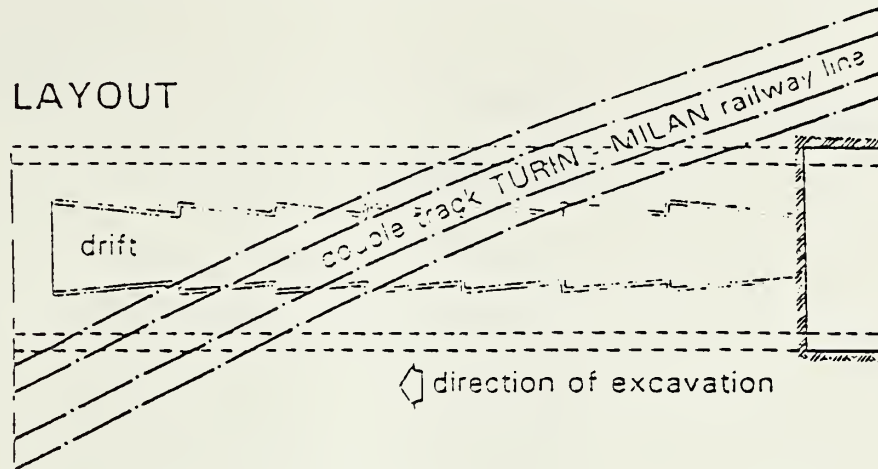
Use of sub-horizontal reinforced jet grouting and sub-vertical jet grouting for soil improvement in shallow, soft ground tunnelling.
